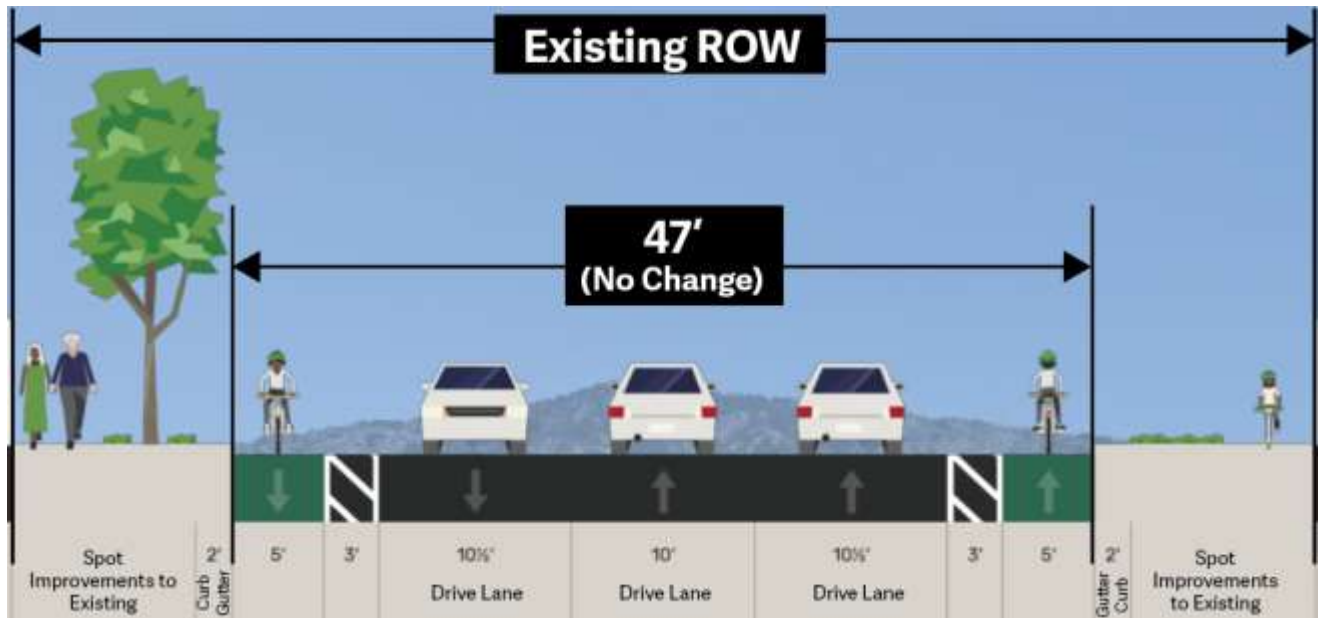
Option 3.7: Three vehicle lanes with on-street protected bike lanes meeting minimum design widths with minimum improvements behind the curb (Looking West)
